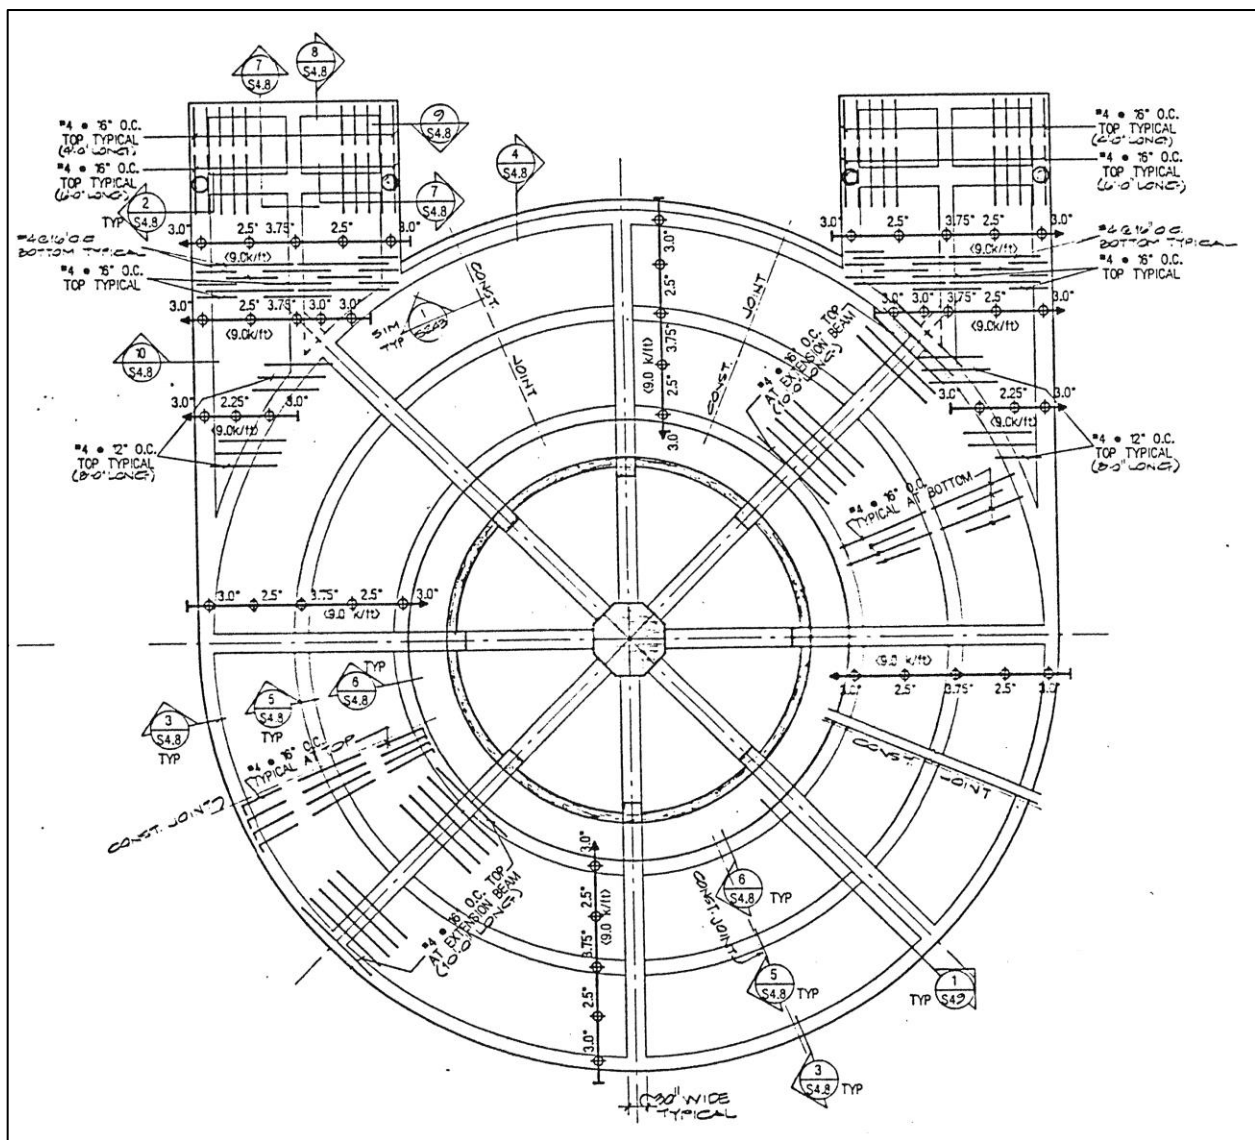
Example of the as-built 1988 structural drawings showing the post-tensioning and epoxy reinforcement in the up-helix ramp from second to third floor.
